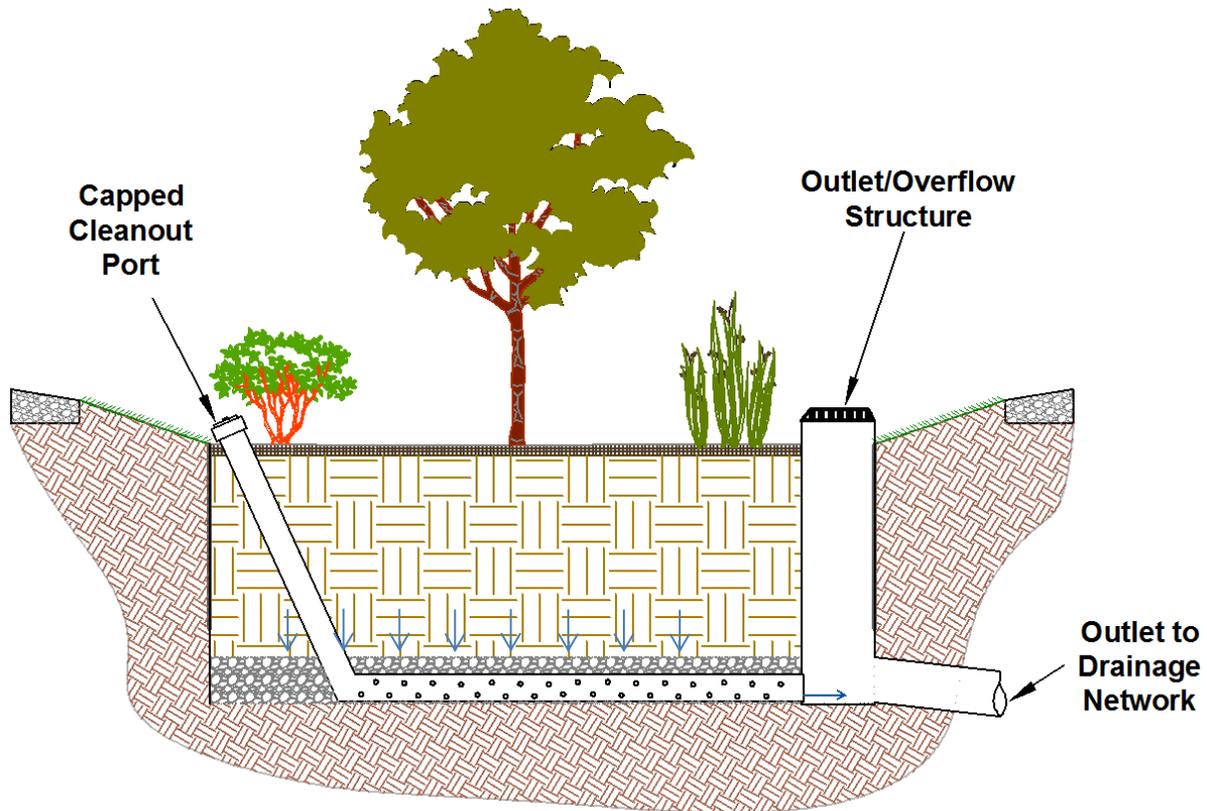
Conventionally drained bioretention cross section showing underdrain.
